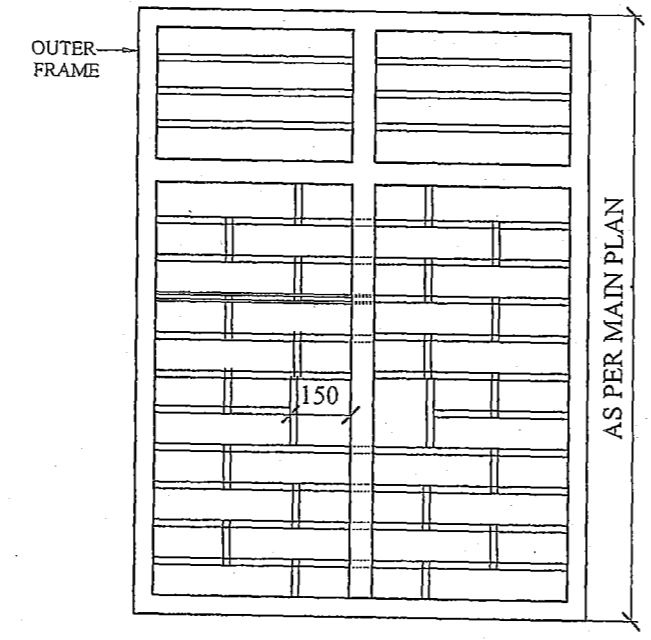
DETAIL OF OUTER SHUTTER FRAME MADE OF ERW TUBE 'P' SECTION
